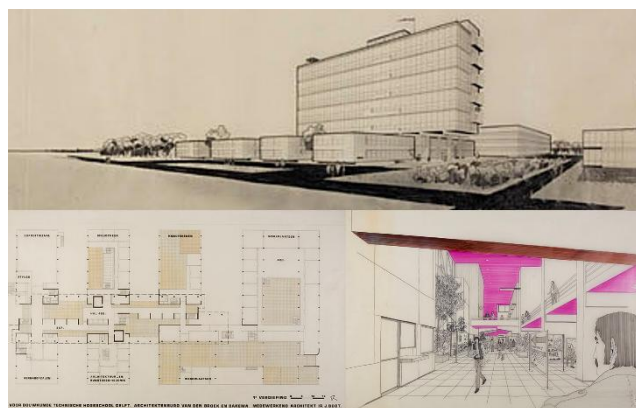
Drawings of the first Delft TU Faculty of Architecture Building, 1956(NAI, 2008)
